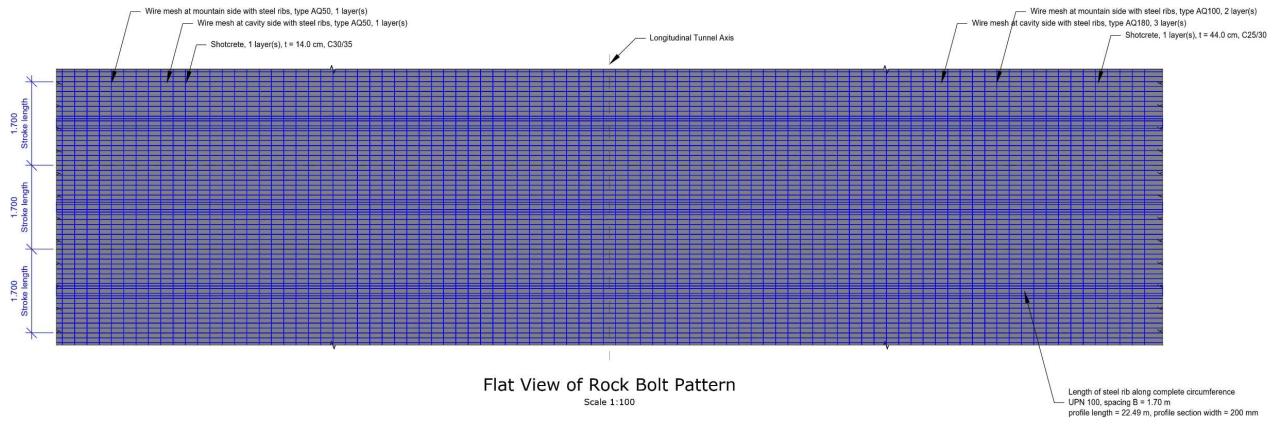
Plan view output on drawing – Wire mesh and steel ribes
